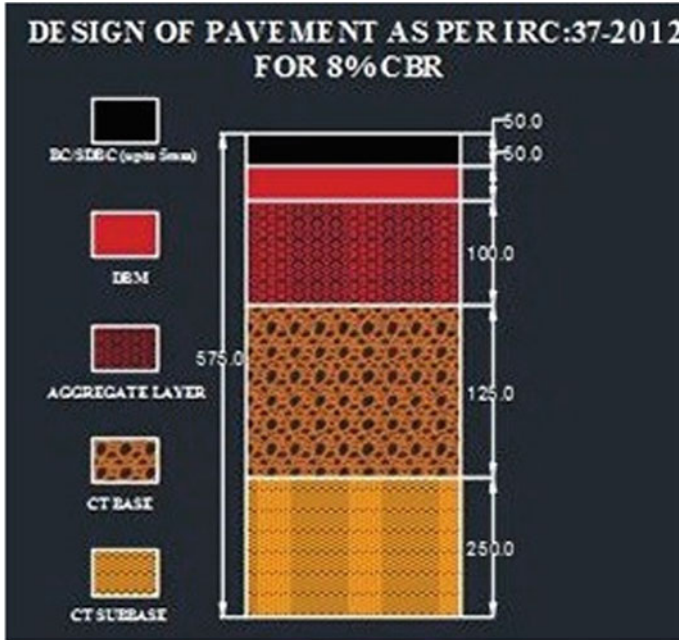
Design of pavement Cross-section 2 as per IRC:37-2012 for 8% CBR in mm
